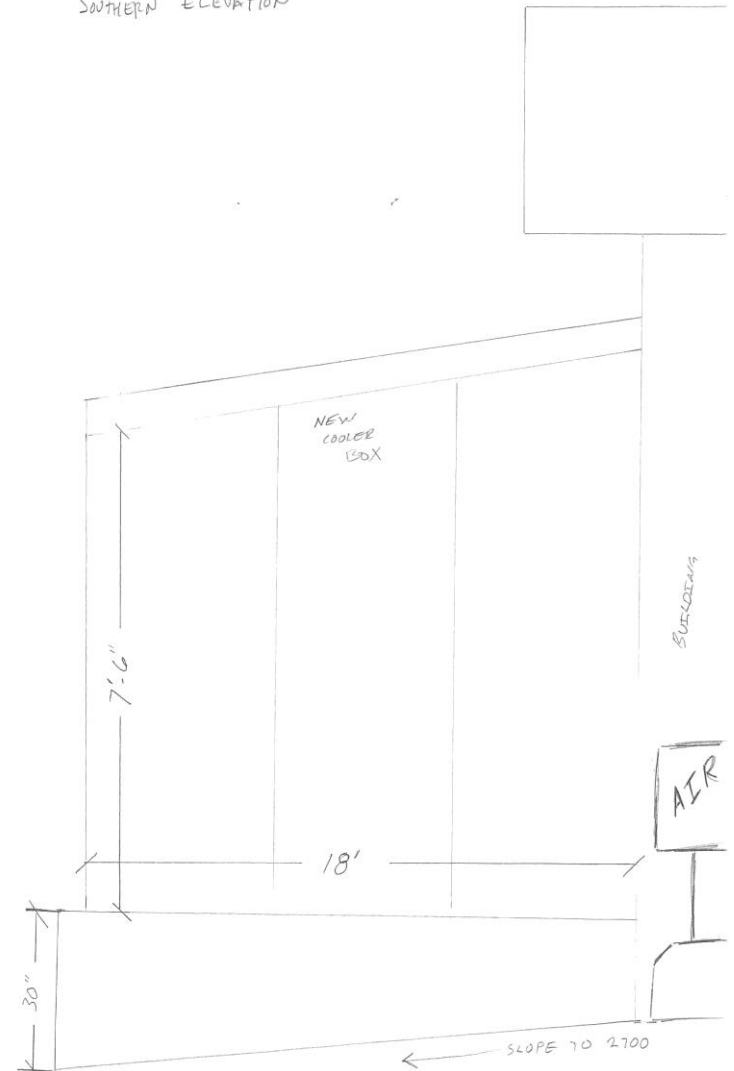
EXHIBIT "D" – PROPOSED BUILDING ELEVATIONS
